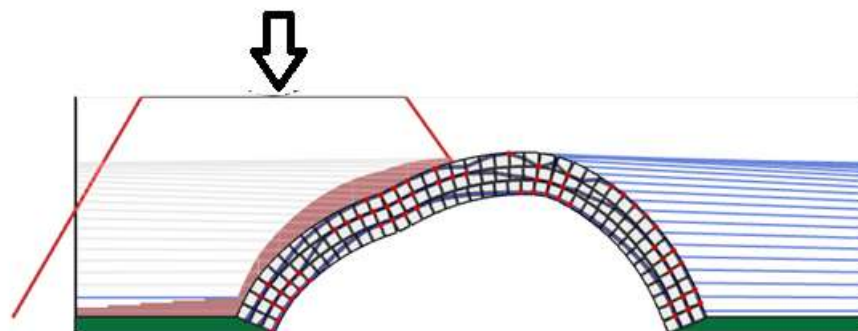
Collapse mechanism for arch loaded by 2 m square footing, column position at arch left support
